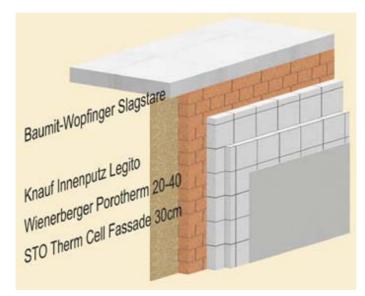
Insulated brick wall construction: Therm Cell[®] mineral foam board (STO), Porotherm[®] brick masonry (Wienerberger), Legito[®] interior stucco (Knauf), Slagstare[®] cement-free concrete (Baumit-Wopfinger).
